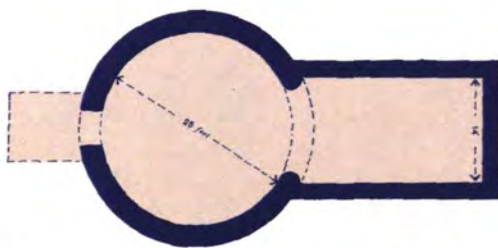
Plan of a round-naved parish church at West Thurrock, Essex.
